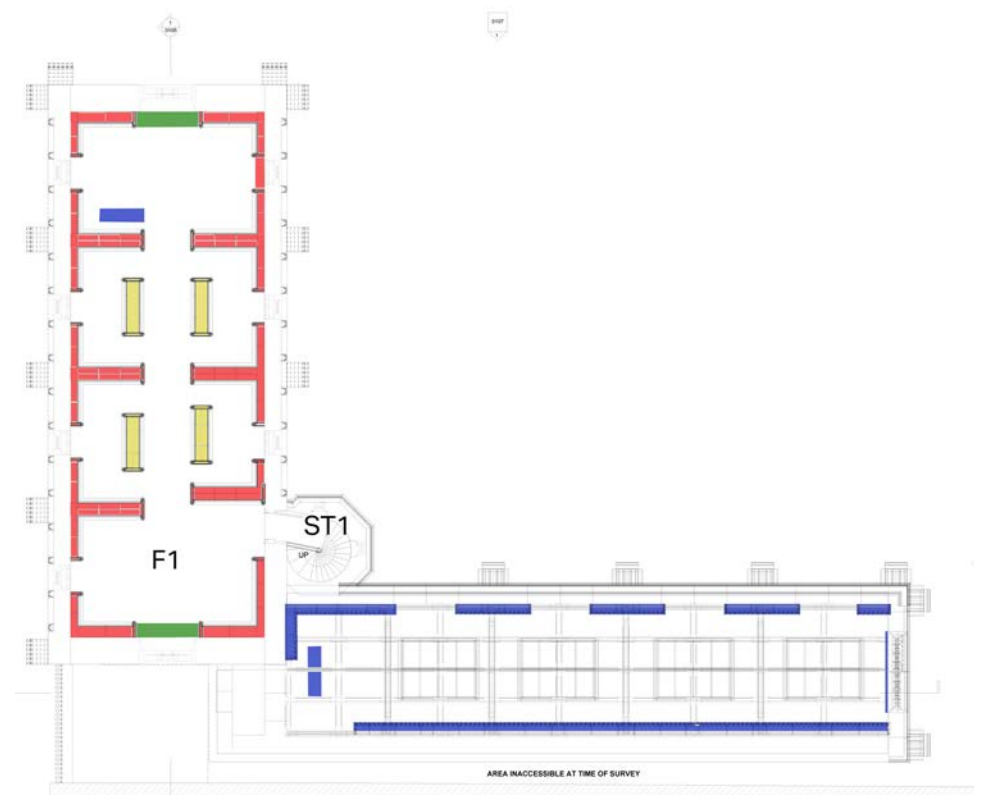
A first floor plan showing the layout of Scott's original bookshelves in red, 2019 (Donald Insall Associates)
